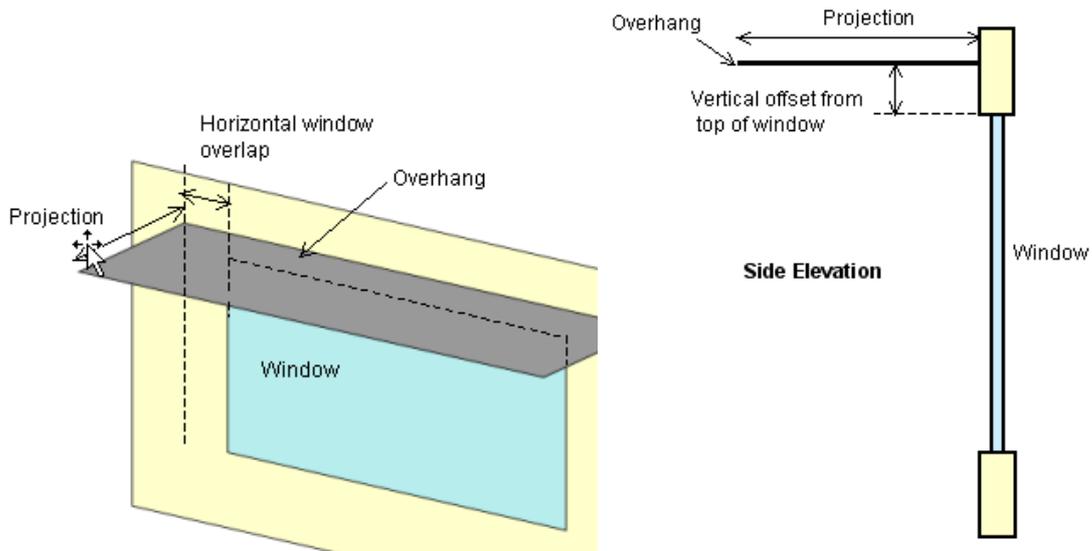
a) Overhang shading front elevation. b) Overhang shading side elevation
